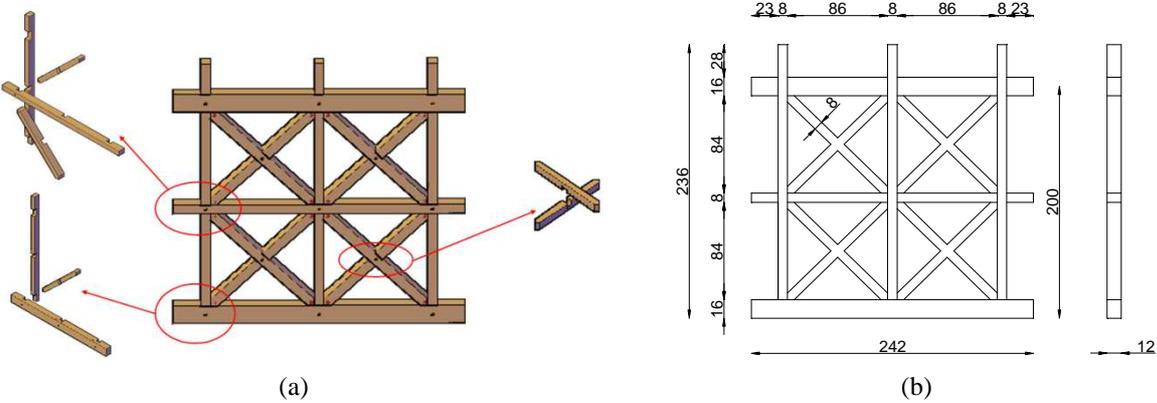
Wall specimens: (a) connections used; (b) dimensions of elements in cm
